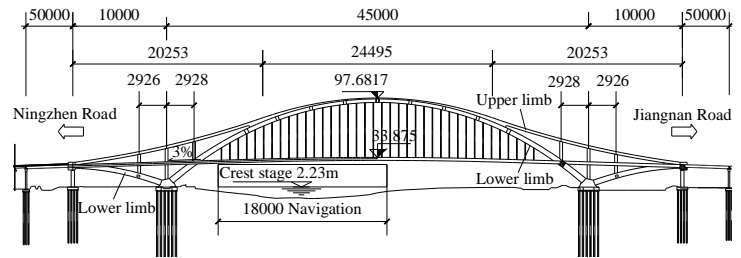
General view of Yongjiang bridge (Unit: mm)
